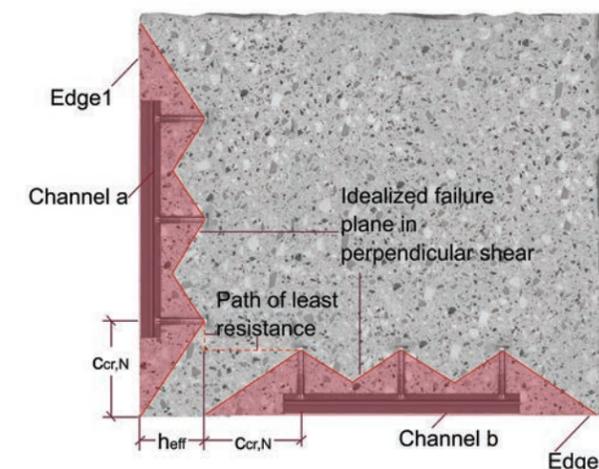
Minimum distance between anchor channels at the corner to assure the breakout cones do not intersect — Tension
